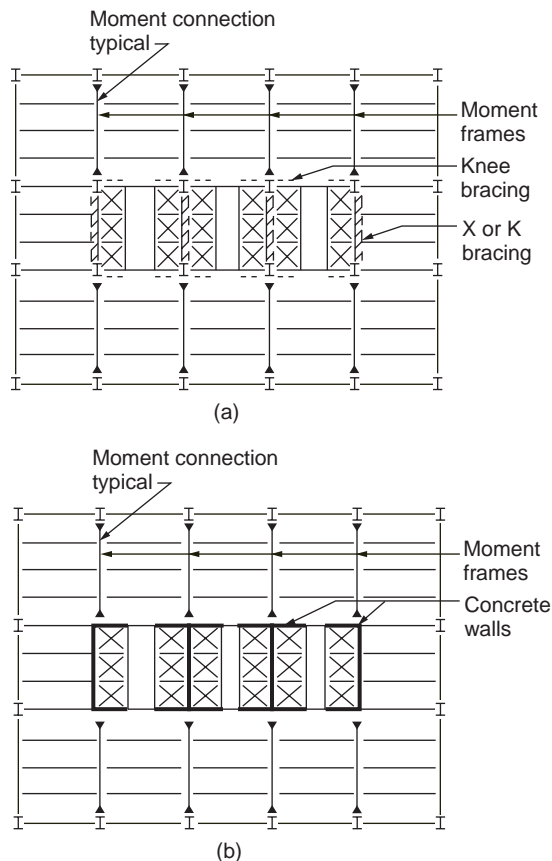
(a) Moment frame with internal braced trusses. (b) Moment frame with internal core walls.
